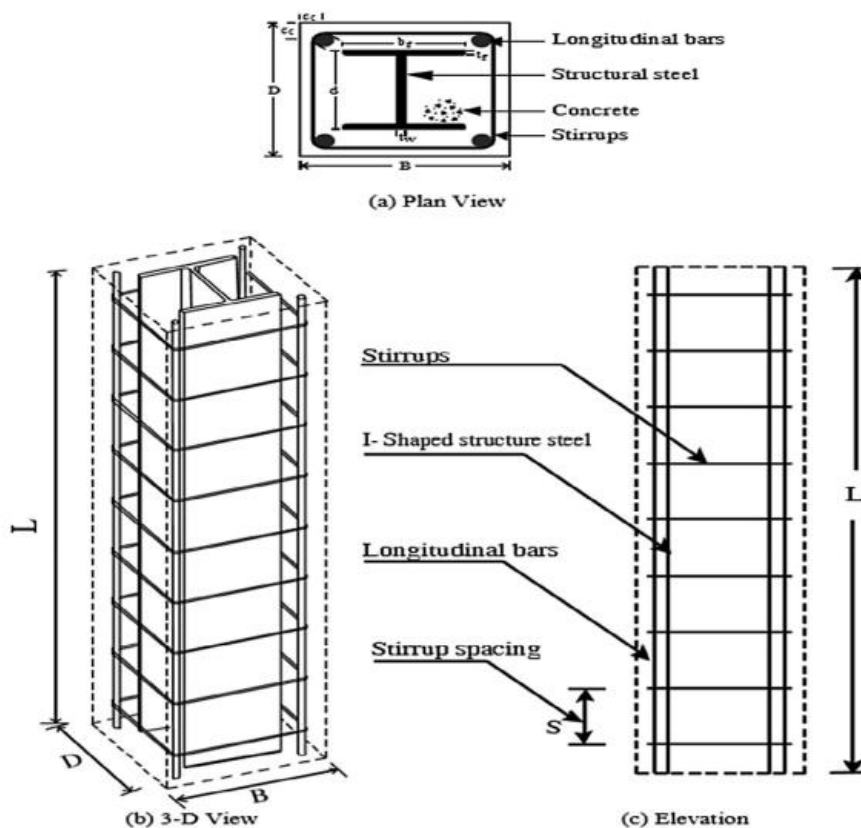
6 :REC Column ;(a) plan view ;(b) 3D view and (c) Elevation(Kartheek and Das, 2020)
